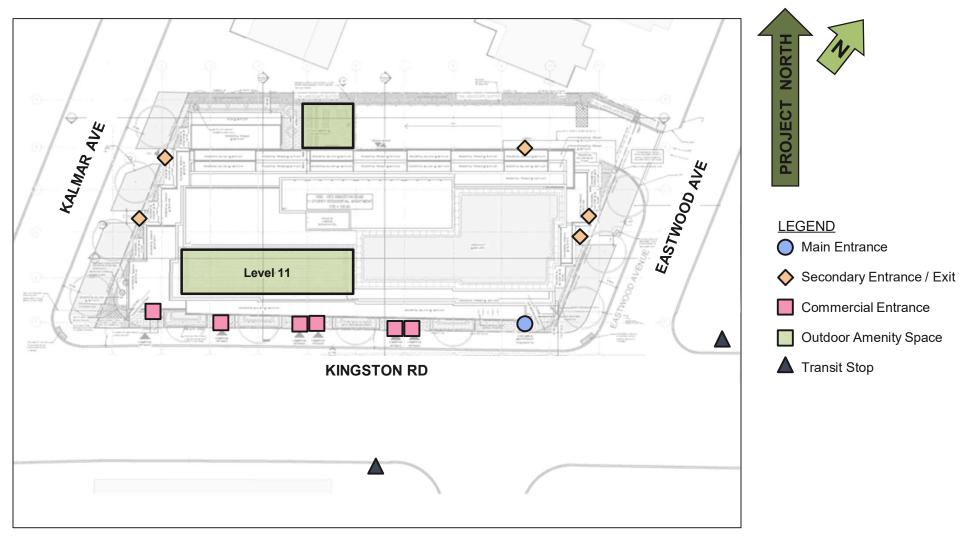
Site plan showing areas of interest Credit: onespace unlimited inc.
